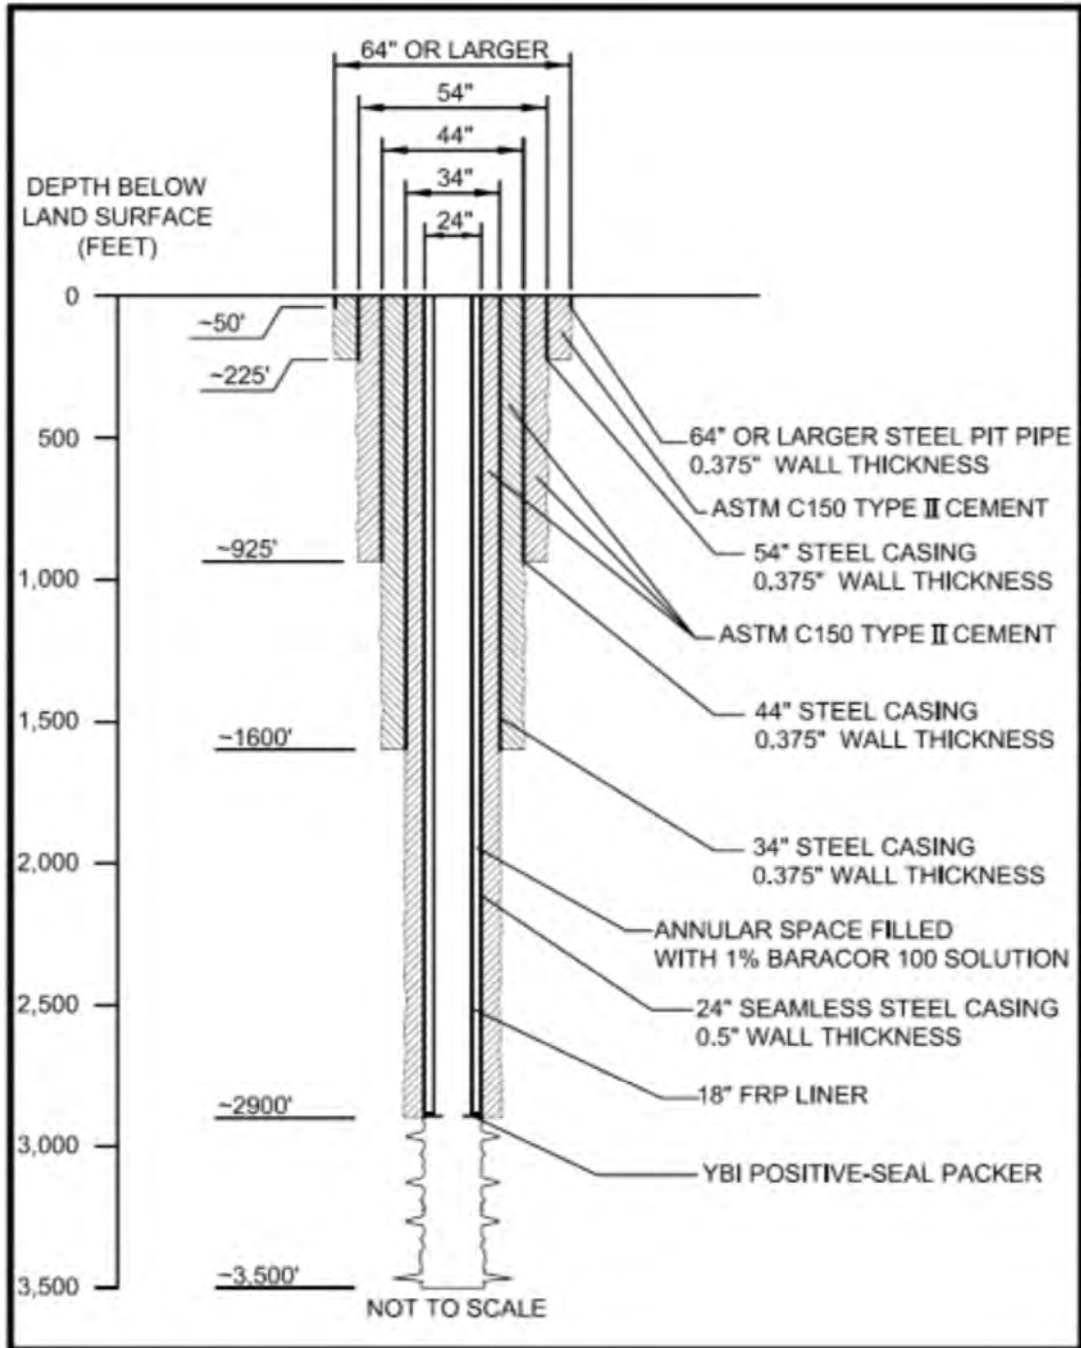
Cross-Section View of a Typical Injection Well Design (FPL 2014-TN4058)
